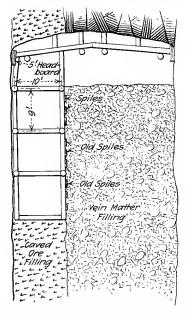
CROSS SECTION OF CAVED STOPE SHOWING STULL SUP-PORT UNDER BACK AND THREE FLOORS OF SPILED DRIFT
